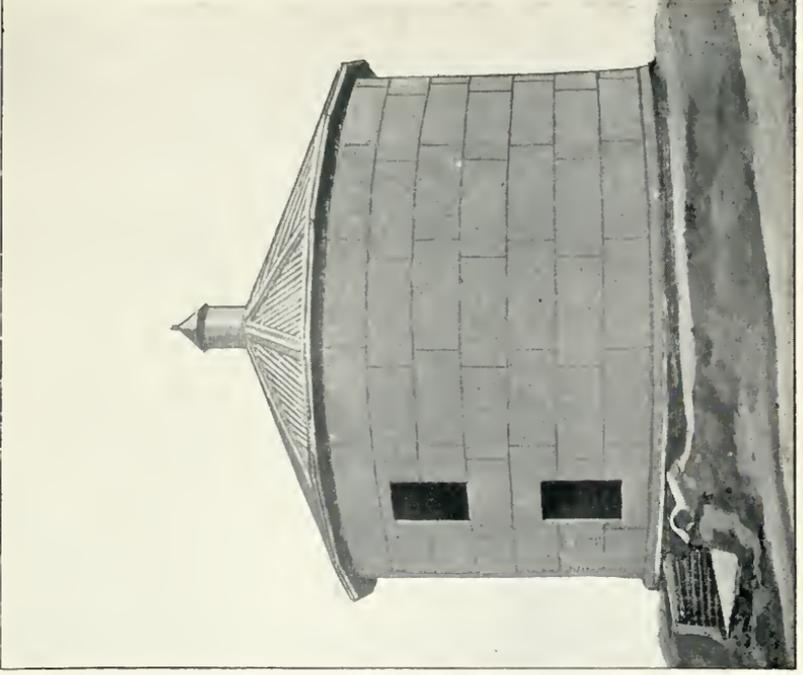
SILO IN BRICK FOUNDATION, OUTSIDE WALLS PLAIN GALVANIZED IRON.
